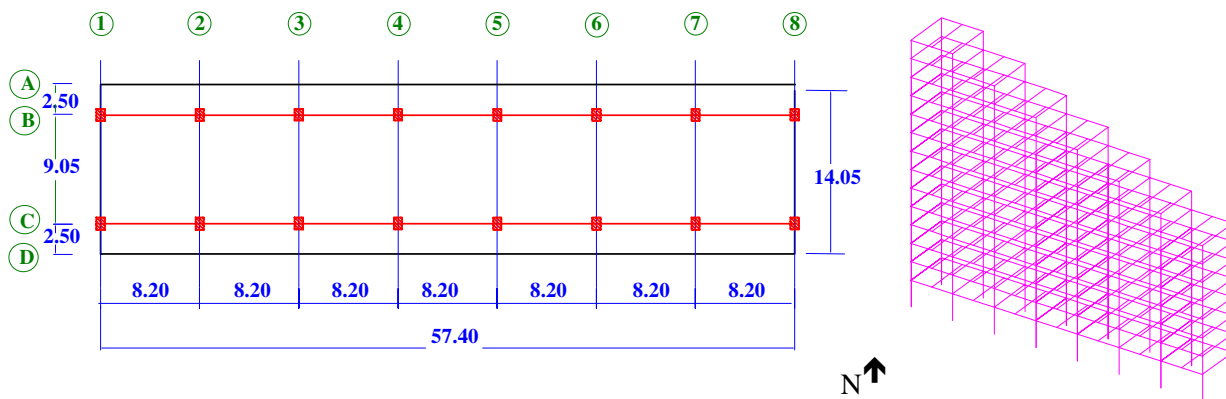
Plan and 3D ETABS model for IR2A building (dimensions in meters).
